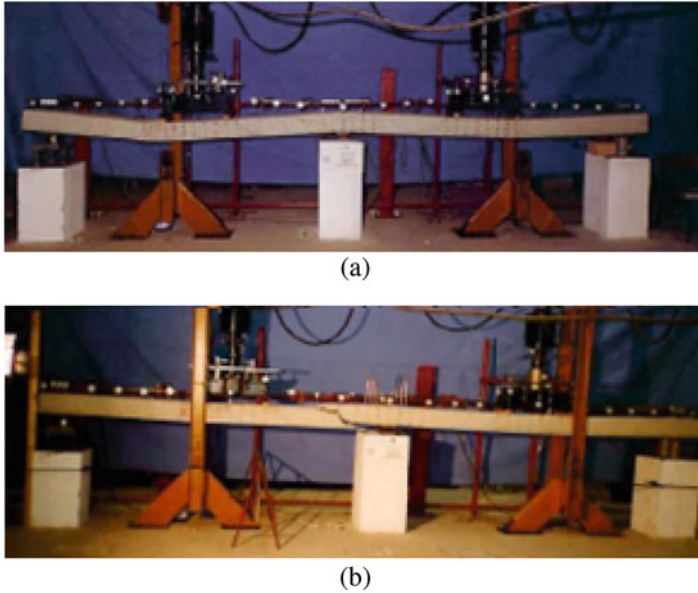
(a) Bending failure mechanism; (b) Shear failure mechanism of a beam
